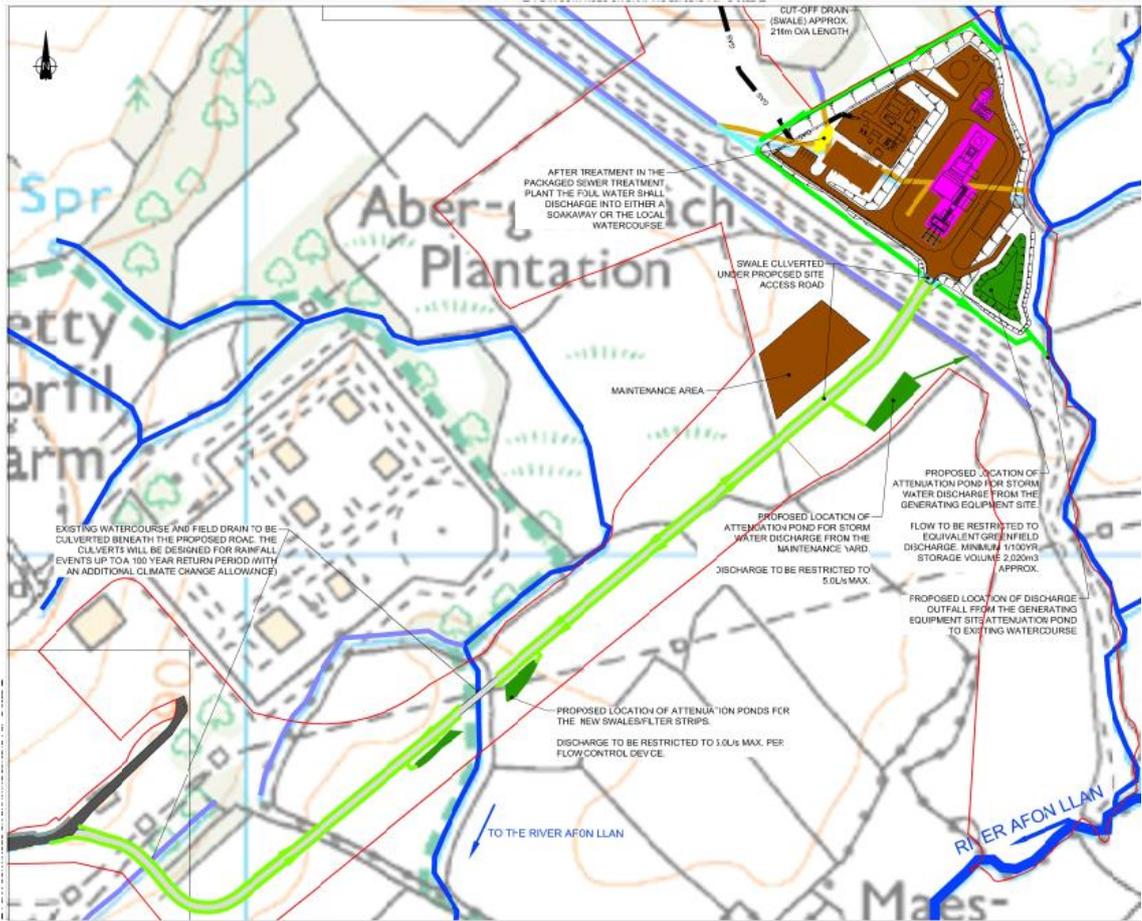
Plan showing nearby drains and watercourse to the site (Central section)
